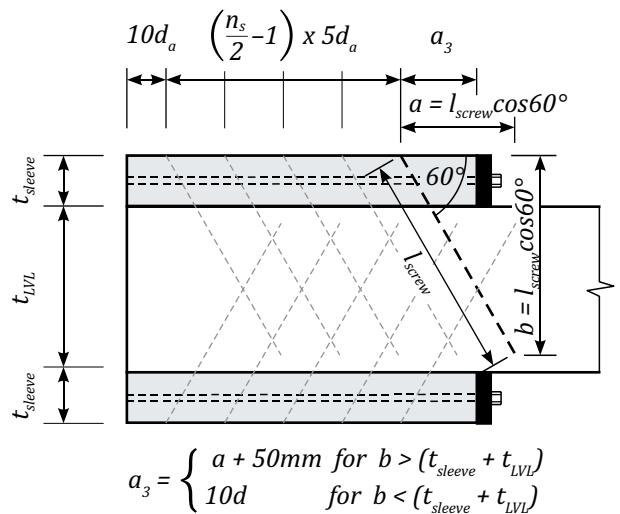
Screw End Distance Requirements for Quick-Connect Moment Connection, top view
